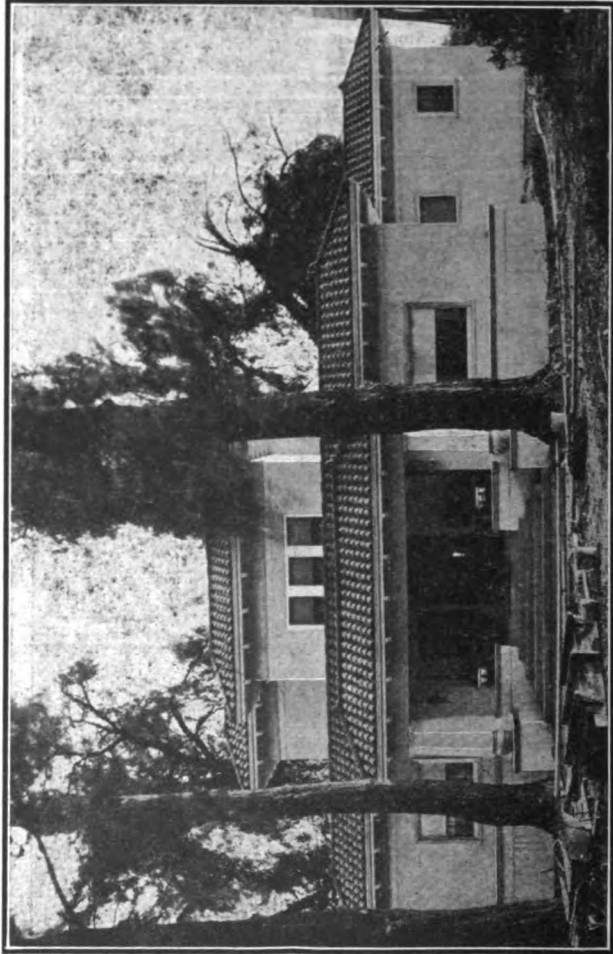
Mission style, burned clay roofing tile. Cut by courtesy of Simons Brick Co.
